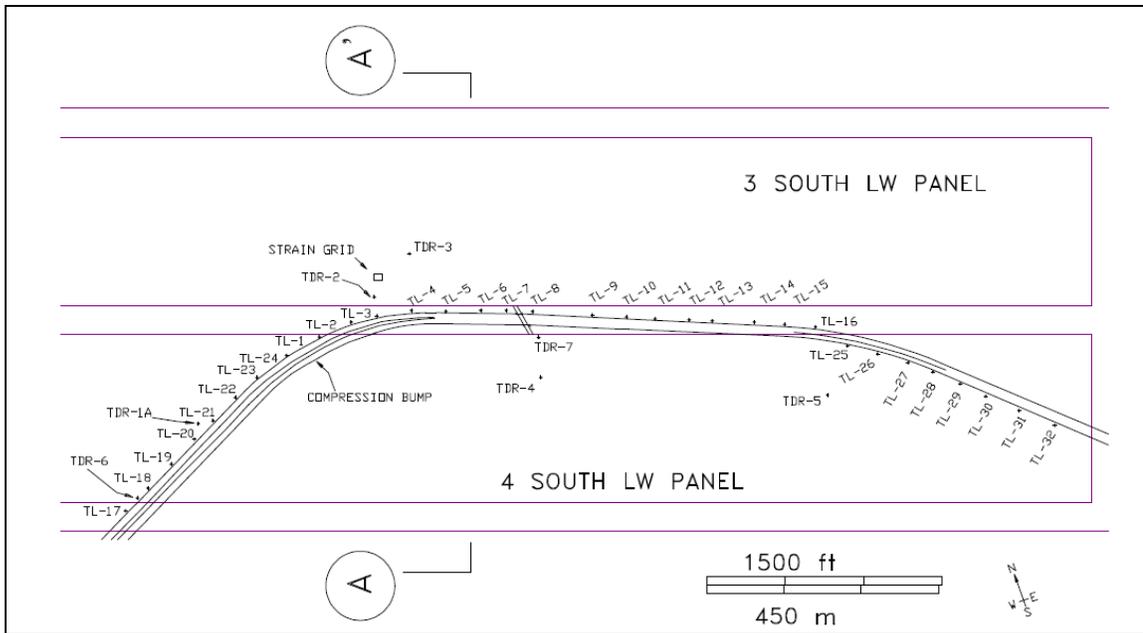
Plan of highway, instrumentation, and longwall mine, (TDR – Coaxial cable locations, TL- Tiltmeter locations). (Connor, Clark, Whitlatch, and Dowding 1999)
